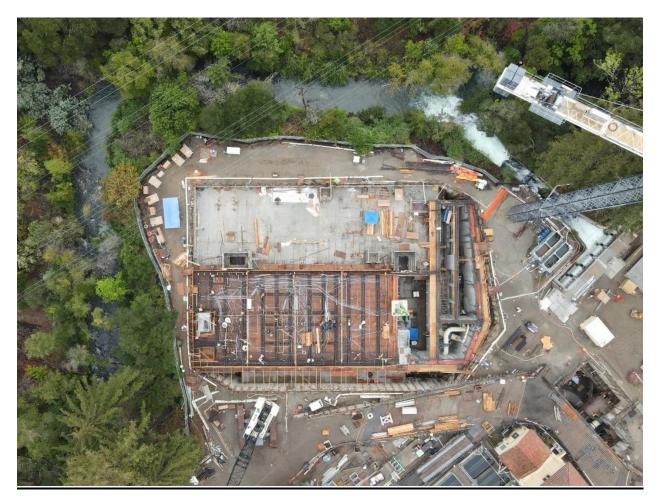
Aerial photo showing the CCB roof deck completed and ready for waterproofing prior to burying under 10 feet of soil. The San Pablo Creek structure can been seen clearly in this photo transferring water from the South Spillway to San Pablo Reservoir from Lafayette Aqueducts No. 1 and 2.
